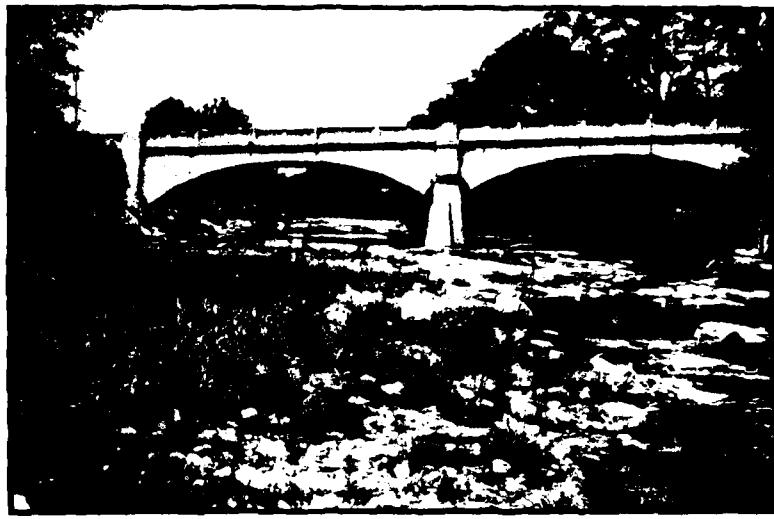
Looking downstream at Borden Road bridge showing rock channel bottom and shoals.
